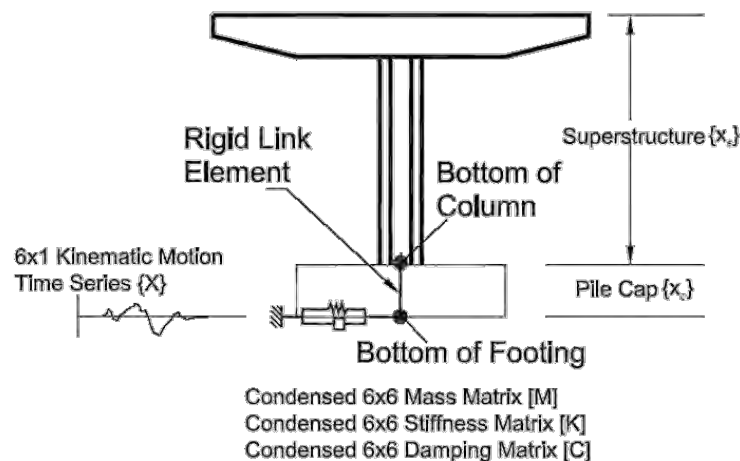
Implementation of Foundation Submodel in the Global Structural Model
